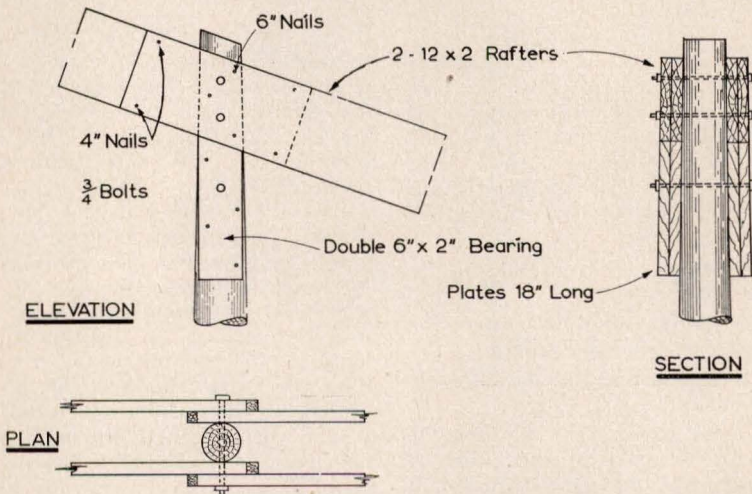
RAFTER ATTACHMENT AT INNER POLE (LEAN-TO ROOF)
